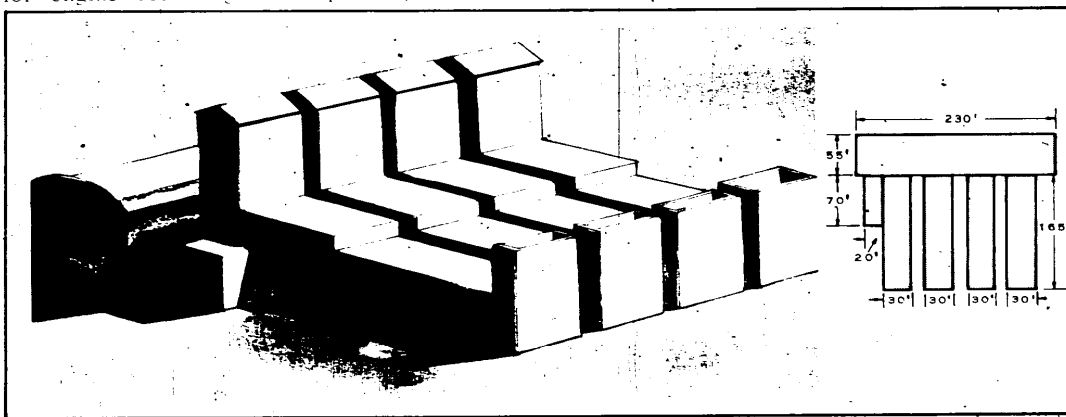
PLAN AND PERSPECTIVE VIEWS OF ENGINE TEST BUILDING, HA-ERH-PIN AIRCRAFT ENGINE PLANT.
